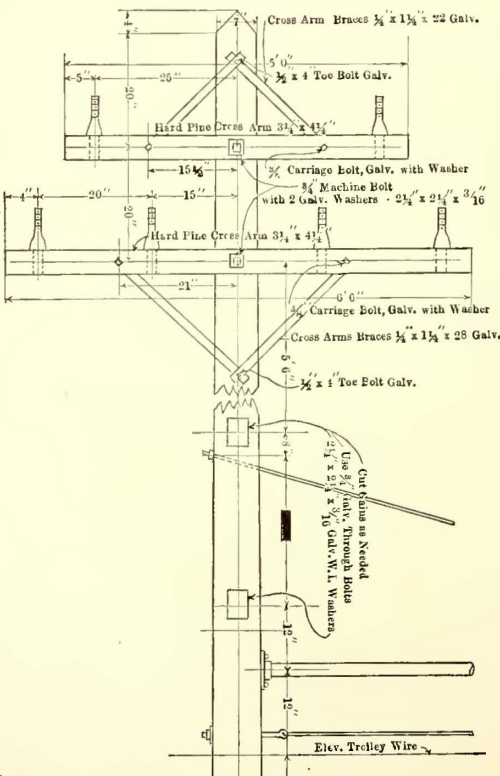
C—Span Construction for One No. 0000 Trolley Wire
